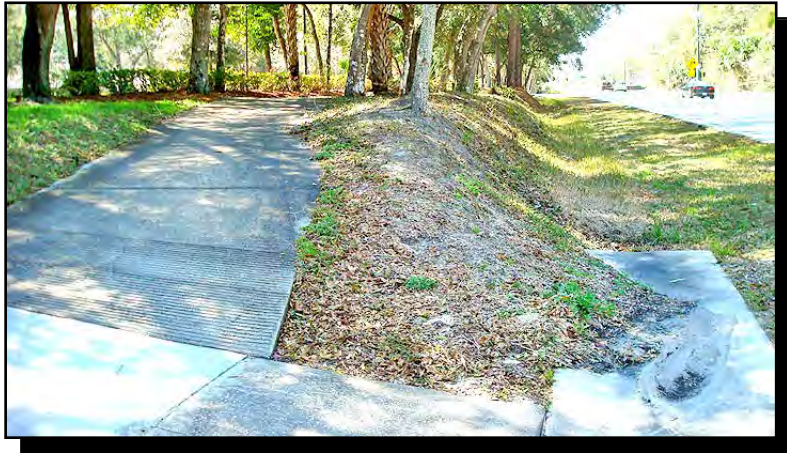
No Level Landing or Ramp at the Intersection of Taylor Road and Boggs Ford Road
